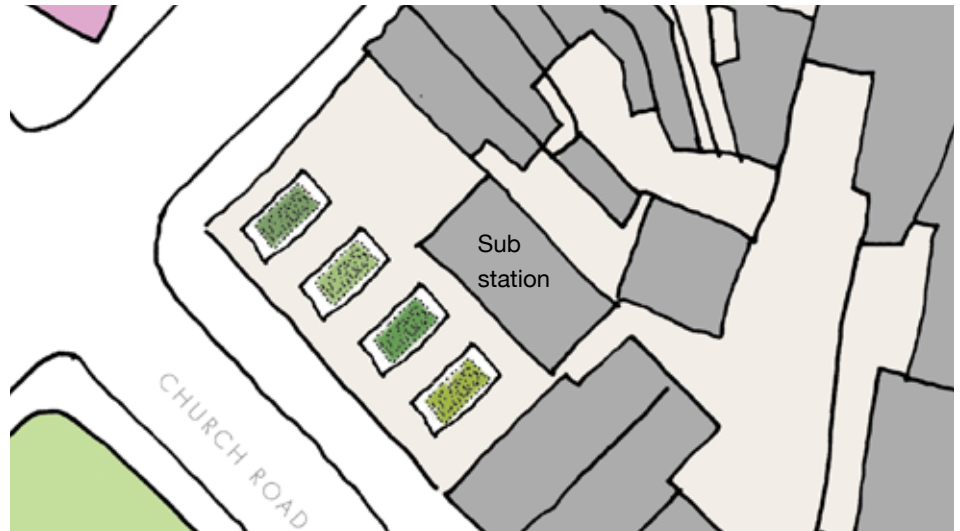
A sketch showing a plan for a temporary community garden at the corner of Church Road
